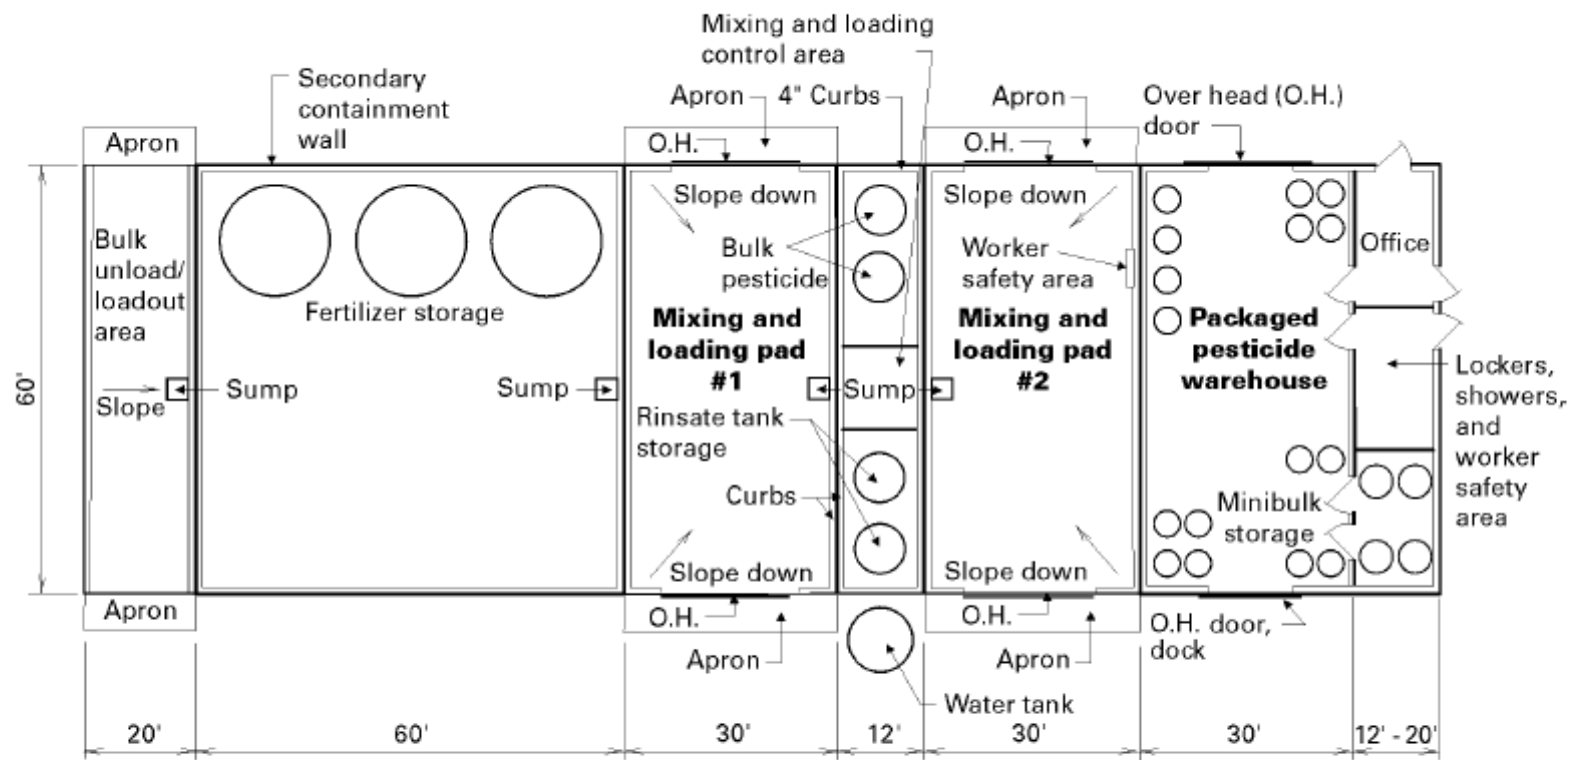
Large-scale facility, plan view. Optional roof over entire facility except fertilizer secondary containment and bulk unload pad.
